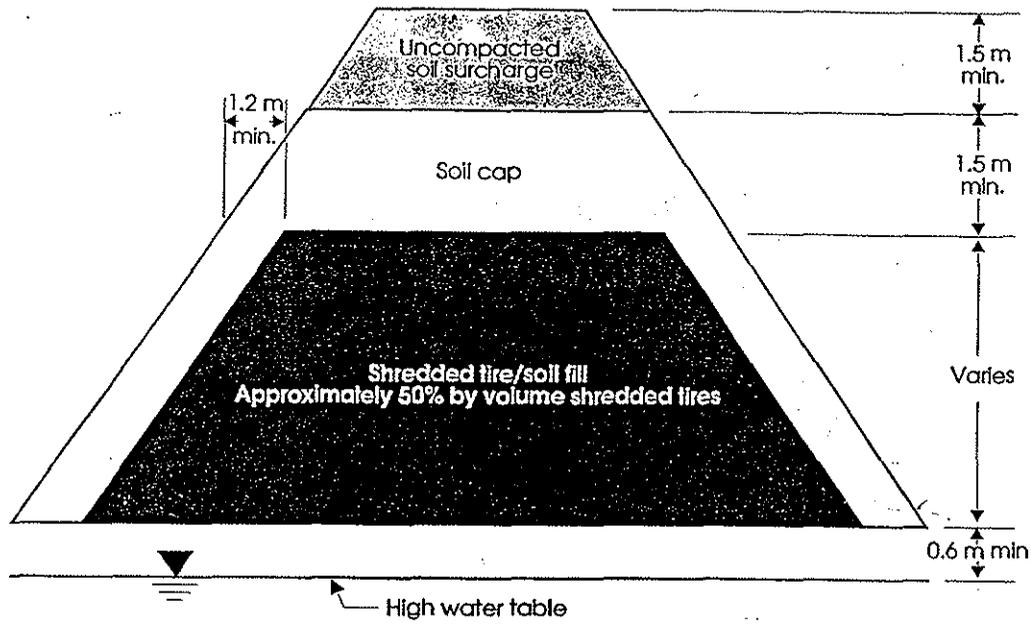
Cross section through lightweight tire shred/soil fill used to reduce settlement of embankment constructed in Virginia (Hoppe, 1994)
